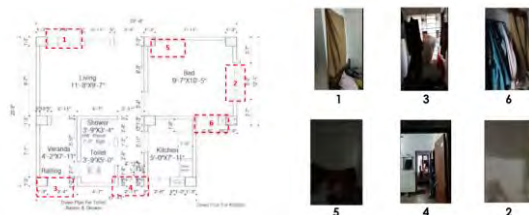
An example of the existing unit plan showing window locations (left) and views (right)
